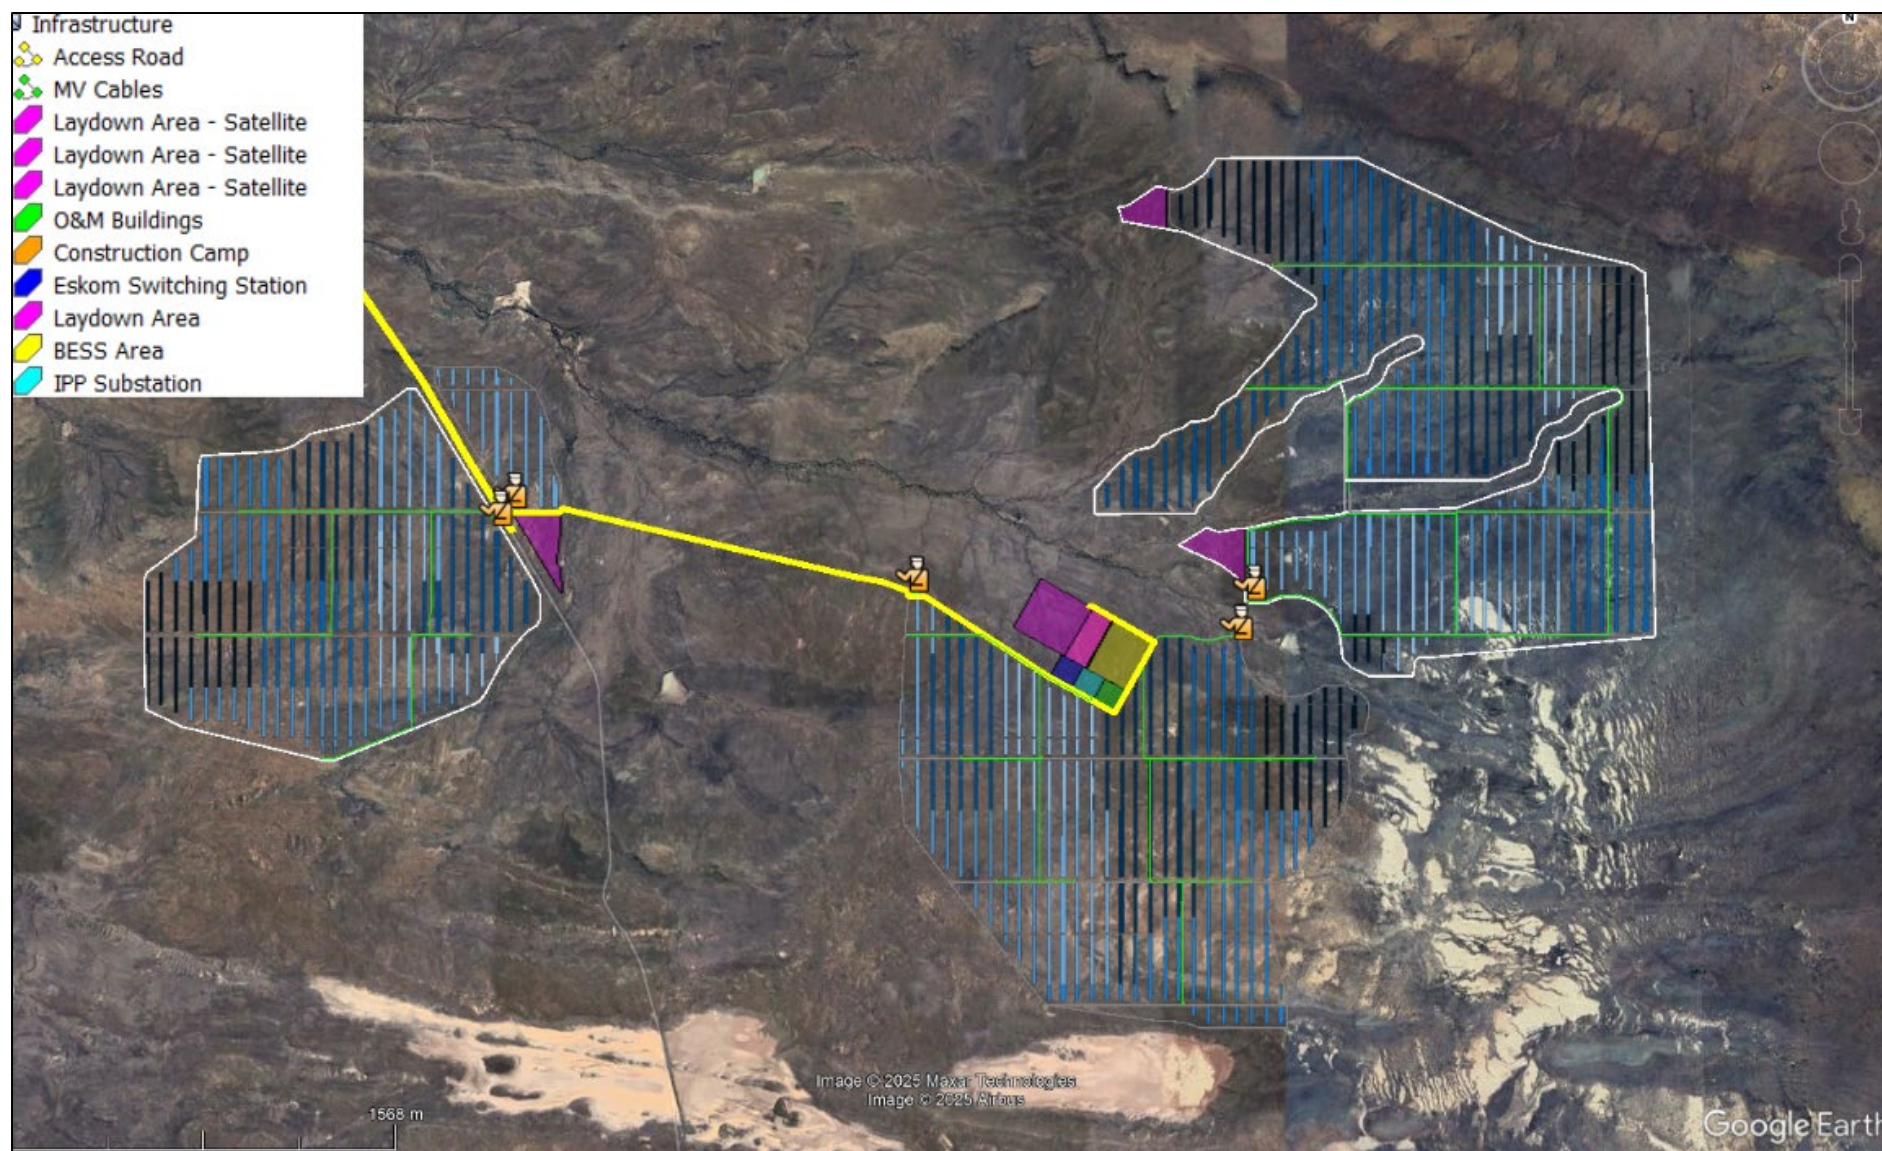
P2AA Proposed Alternative layout plan map exclusive of grid connection routings.
